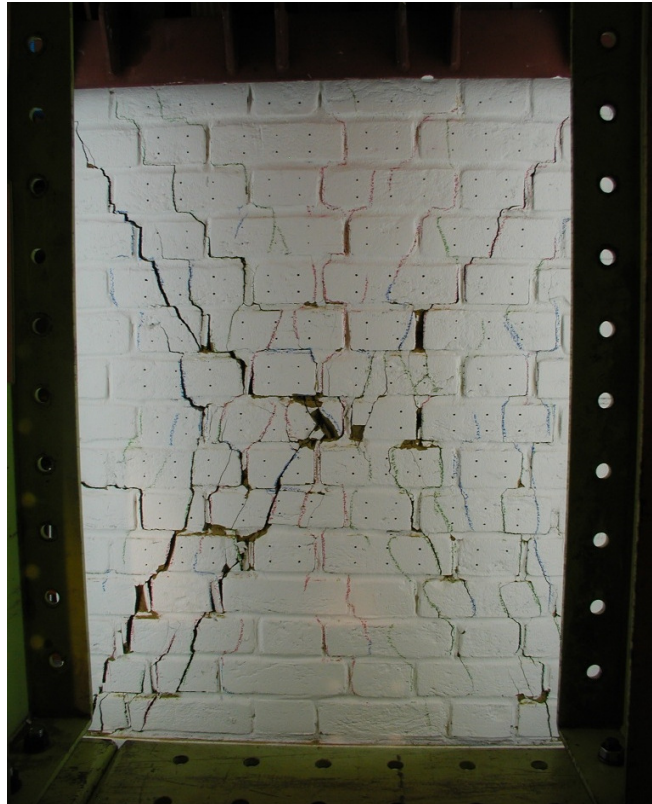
Crack pattern at failure of the plain masonry control wall under a combination of vertical compression and cyclic shear.
